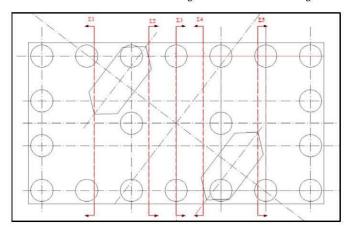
Foundation Cap 1ST, Section Cuts Considered for Transverse Bending Moments
